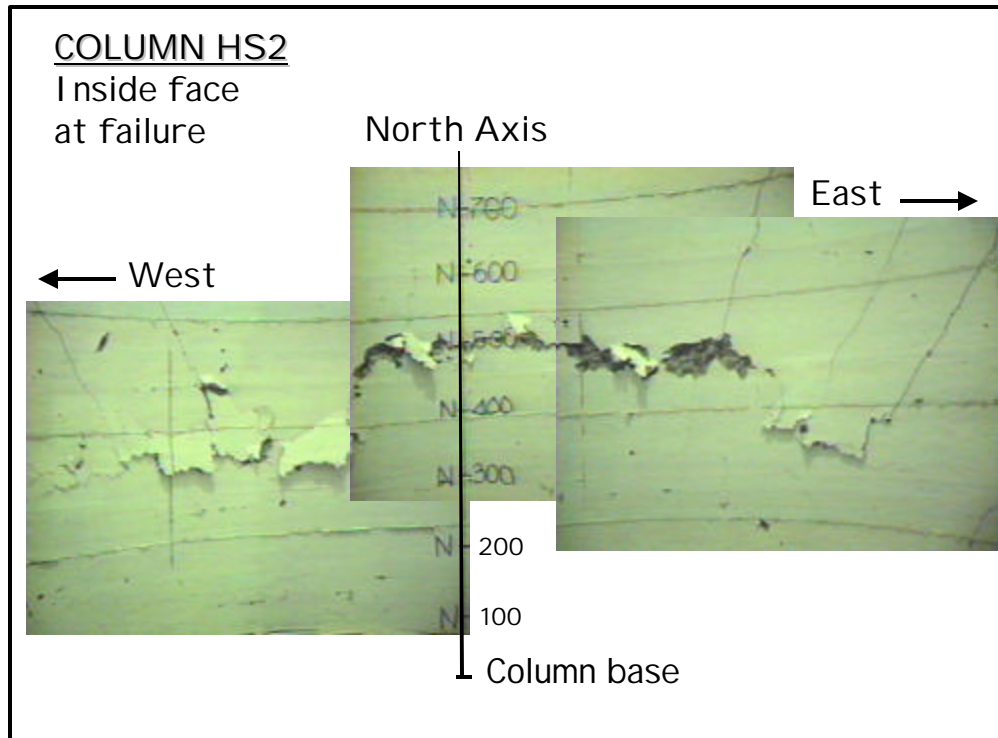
Unit HS2 Spalling of Inside Surface of Compression Zone at $\mu_f = 3.0$, First Cycle
